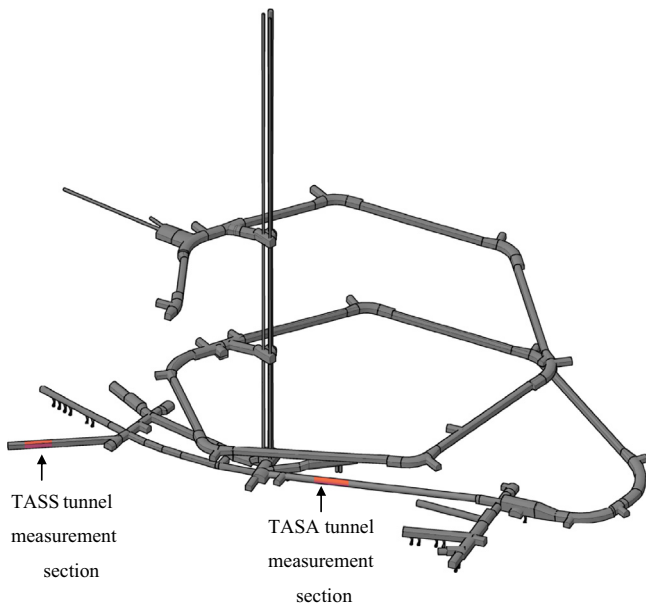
Hard Rock Laboratory from SE direction where the measurement locations in D&B tunnel (TASS tunnel) and TBM tunnels (TASA tunnel) are marked.
